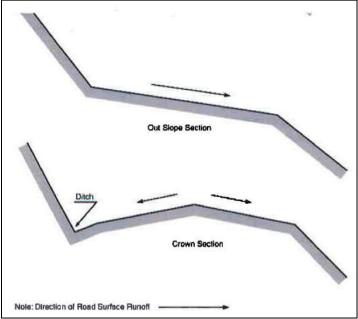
Outsloped and crowned road configurations (USFWS 2005)
